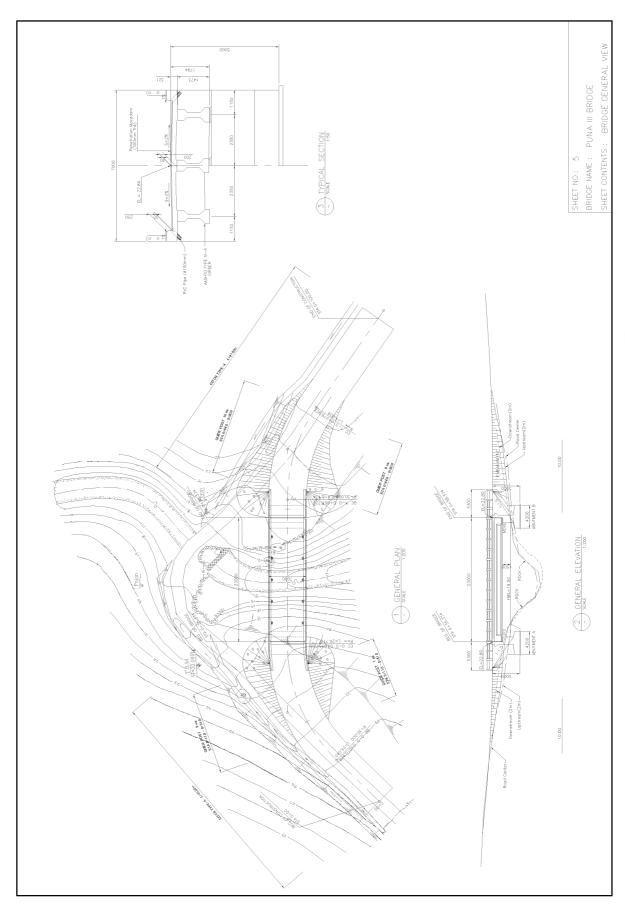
Bridge General View of Puna III Bridge
